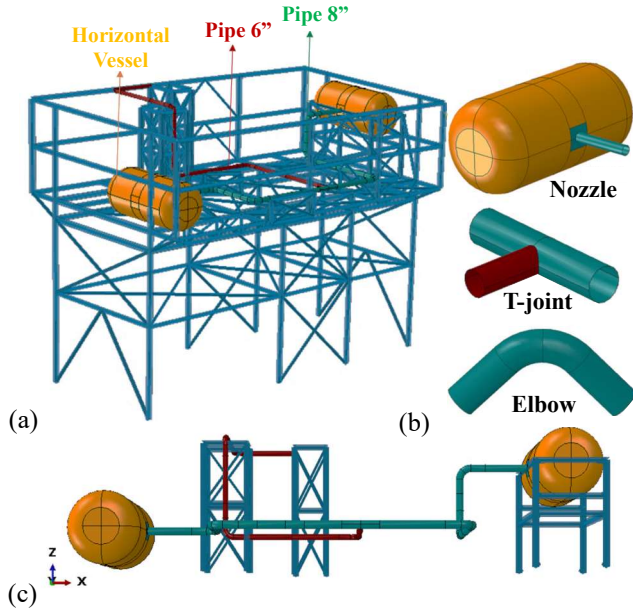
The three-floor petrochemical plant steel pipe rack in CS #1 (a) the overall, (b) the critical components of the piping system, and (c) piping system layout.
